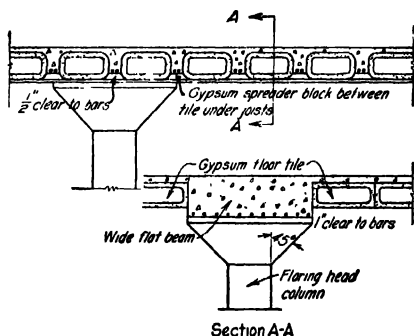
Cross-section of concrete joist and gypsum tile filler design with flat ceiling.
